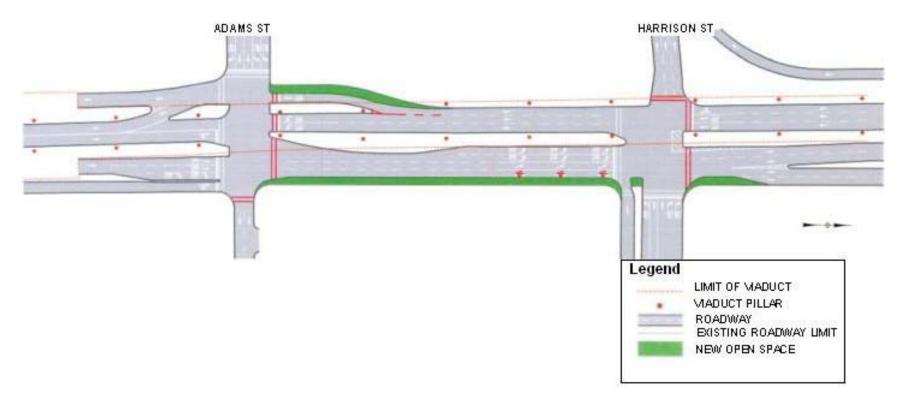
ALTERNATIVE #5 – ALMOND STREET BOULEVARD
